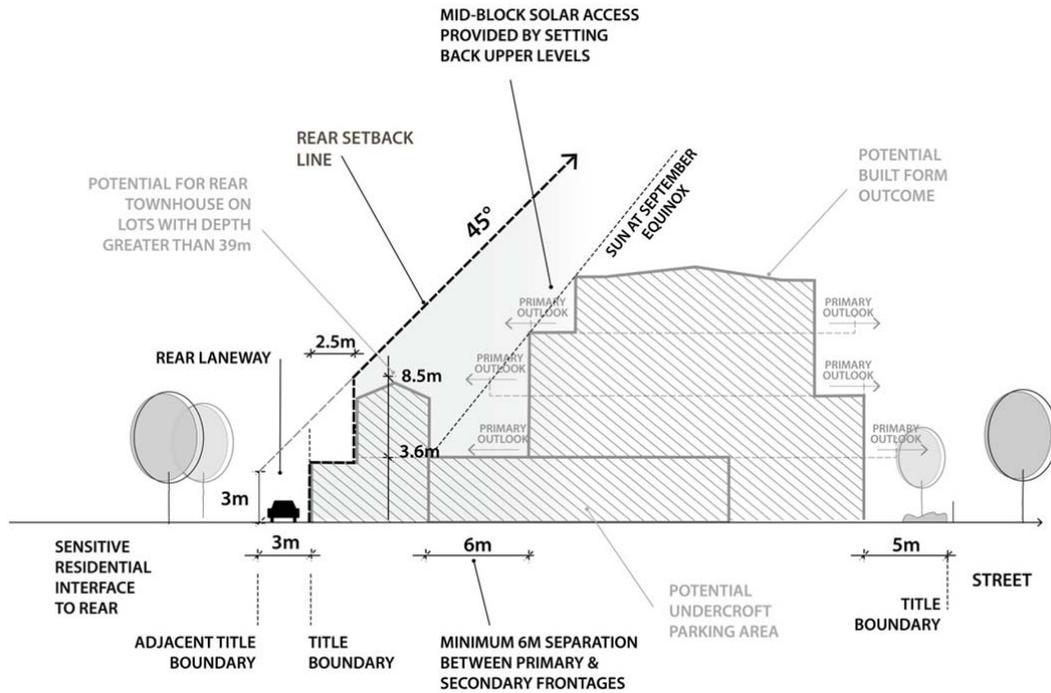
Rear Building Setback Profile: sites with abutting laneway (cross section)
